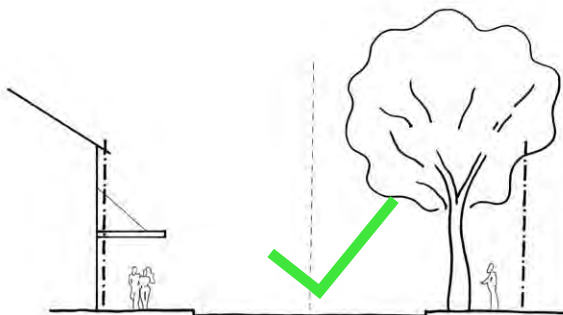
Typical street section with building and awning on one side and medium size street tree on opposite verge. A larger tree planted on the opposite verge can provide substantial benefits where tree planting on both verges is problematic.
